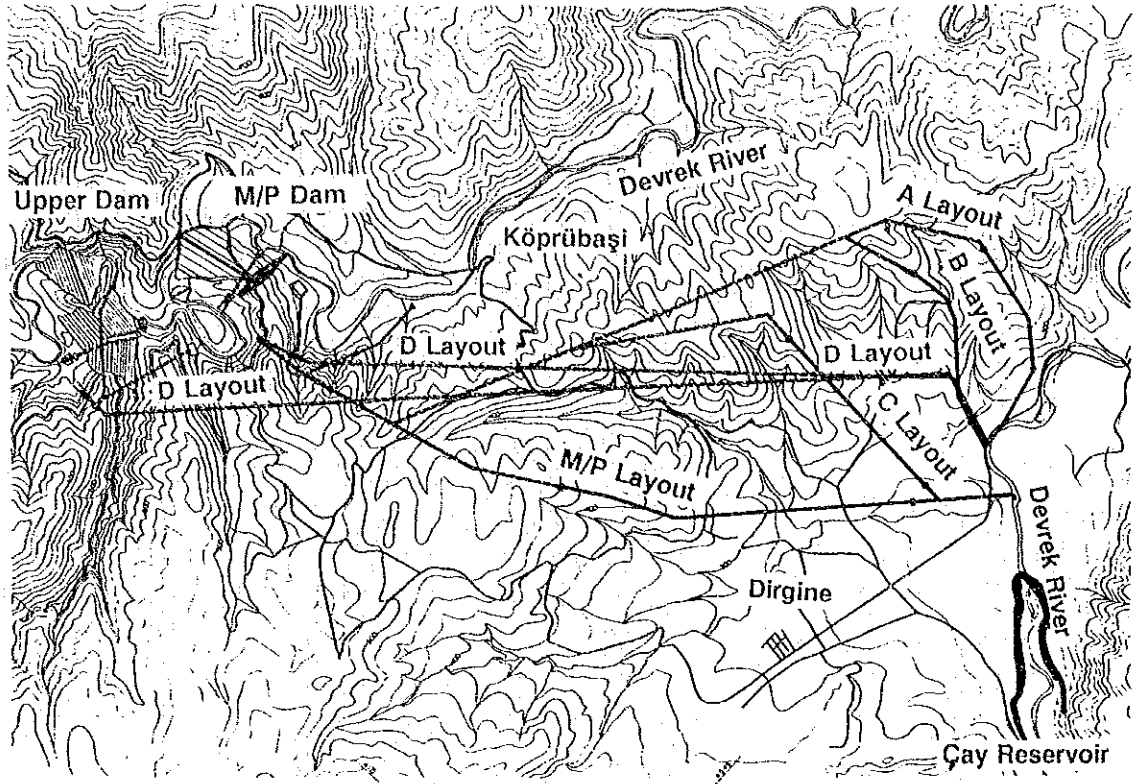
Alternative Development Plan of Köprübaşı Project
